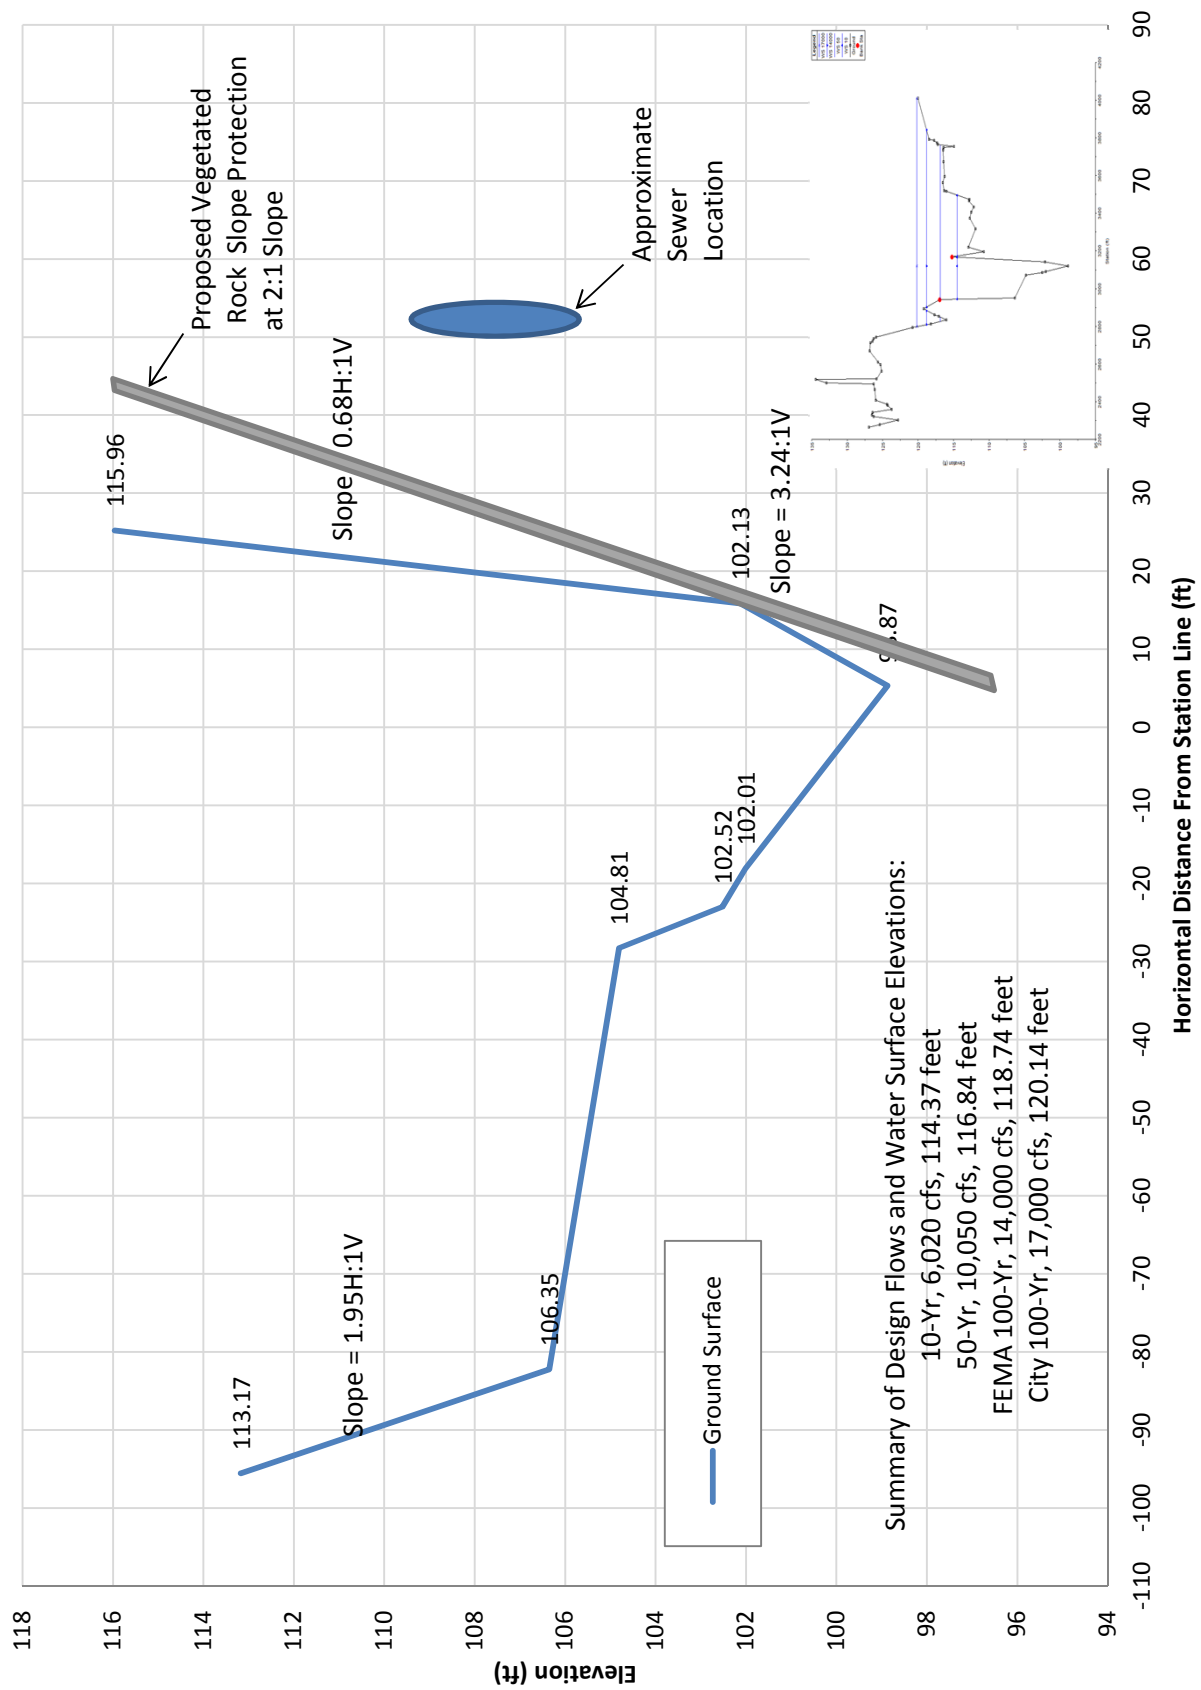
Cross Section 6 (Booth Road Site, at HEC RAS Station 66680)
